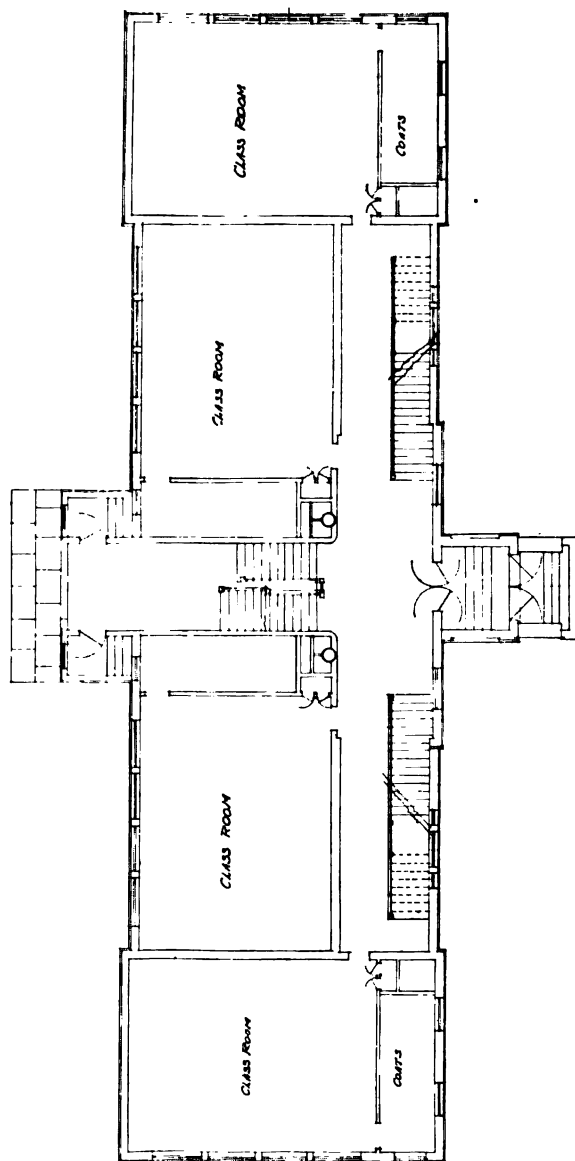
PLAN SHOWING FUTURE EXTENSION, KENWOOD SCHOOL.
